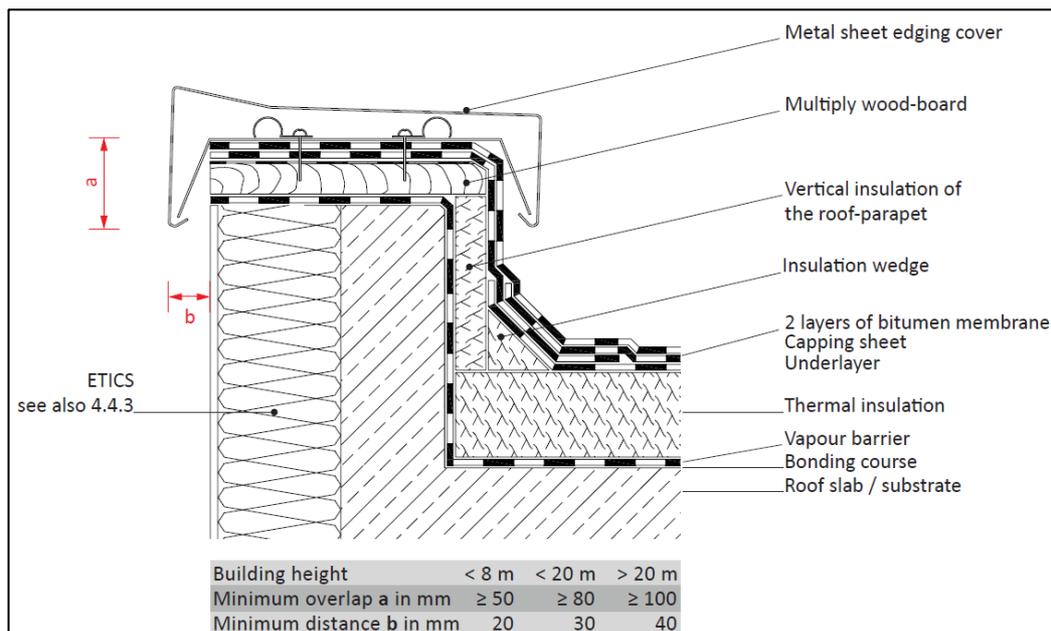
Schematic drawing of a roof parapet with a metal sheet cover dewatering to the roof side. The overlap (a) and (b) depends on the building height
